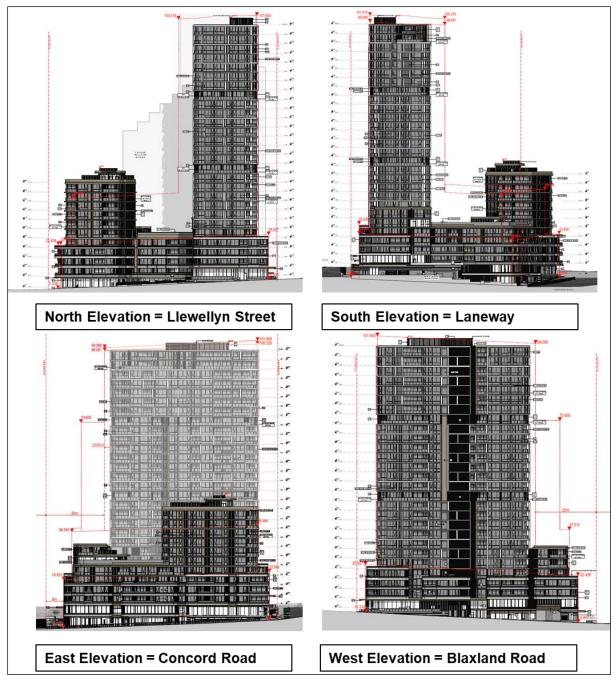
| Proposed Elevations (Source: Applicant's Architectural Plans, Rev E, dated 5/04/2024)
